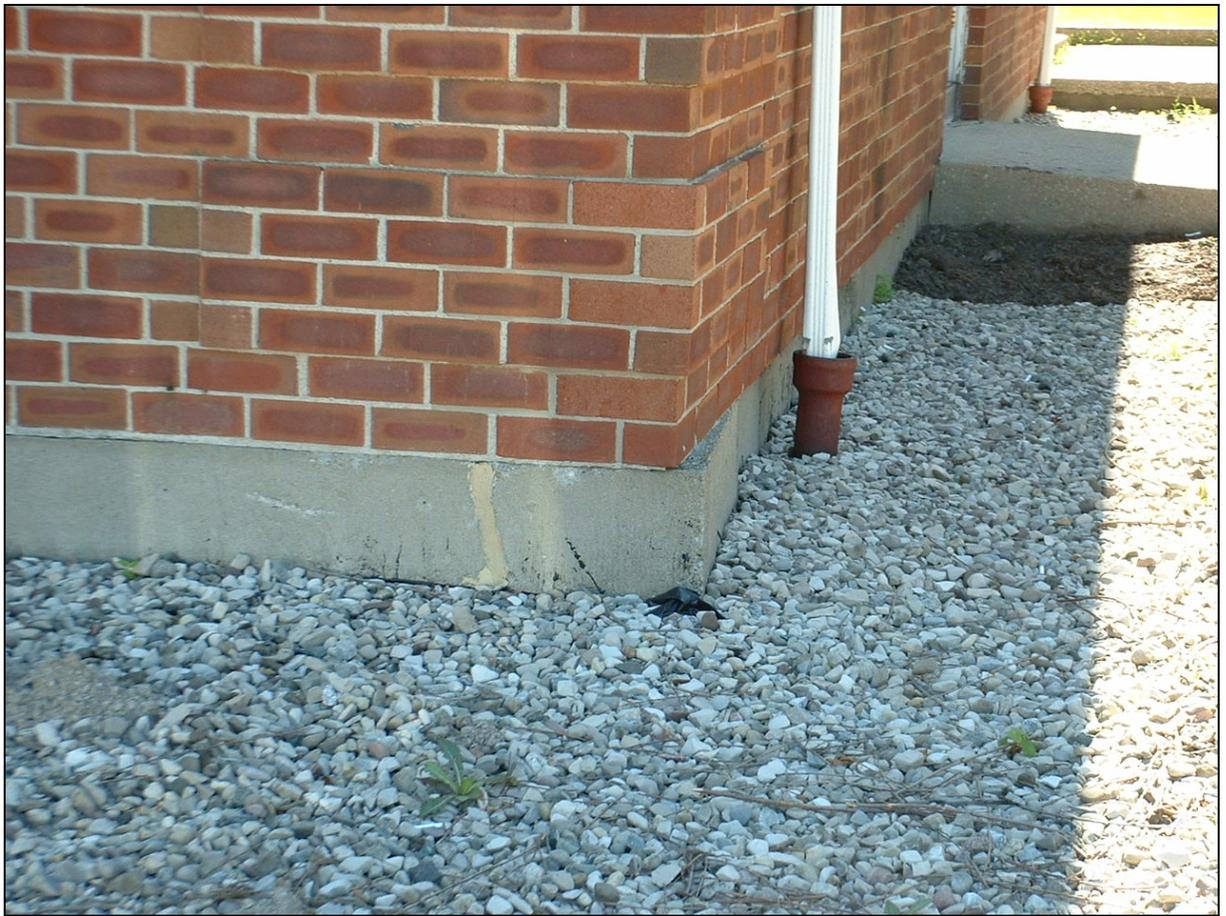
Lateral pressure damage to multi-family apartment complex in south central Amherst (June 2004). Basement walls have corner cracks (patched), and corner block is rotated out. Perimeters soils have settled and pitch into basement wall,; down spouts are often extended and step is settling.
